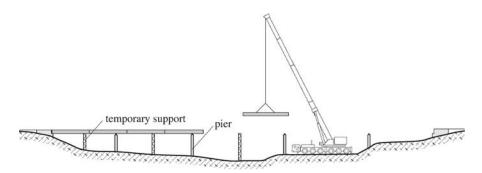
Erection of the steel structure by crane, with additional temporary pier supports.
